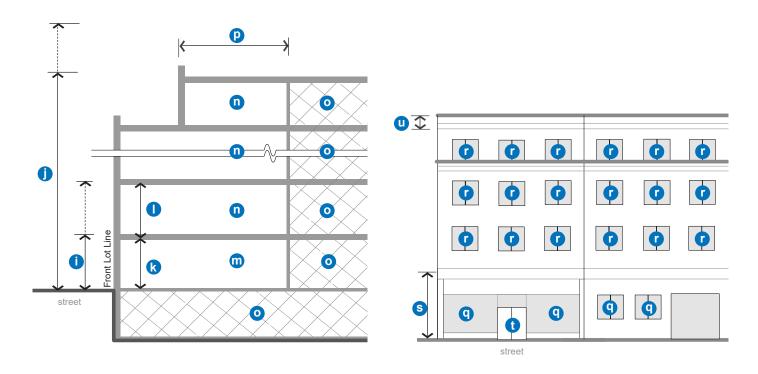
(C)(2) Mid Scale Shop Building: Height and Use Requirements
